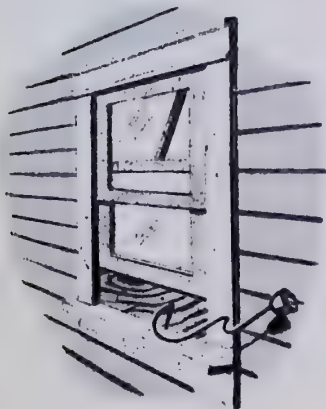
Improvised method of connecting to indoor outlets for outdoor lighting.
